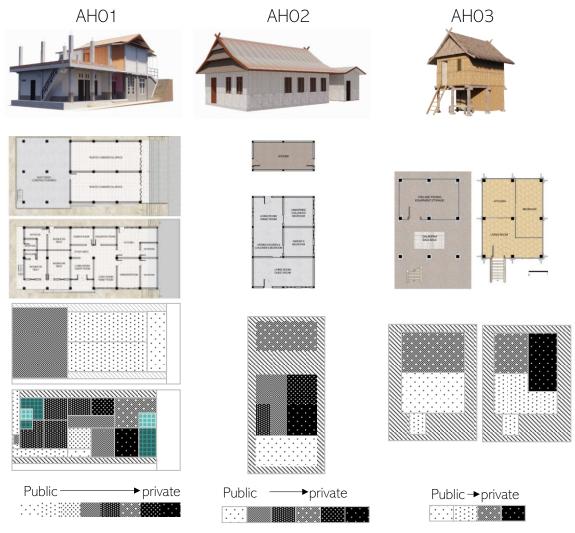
AH's houses in Kampung Air with 3D render, floor plan and layout analysis
